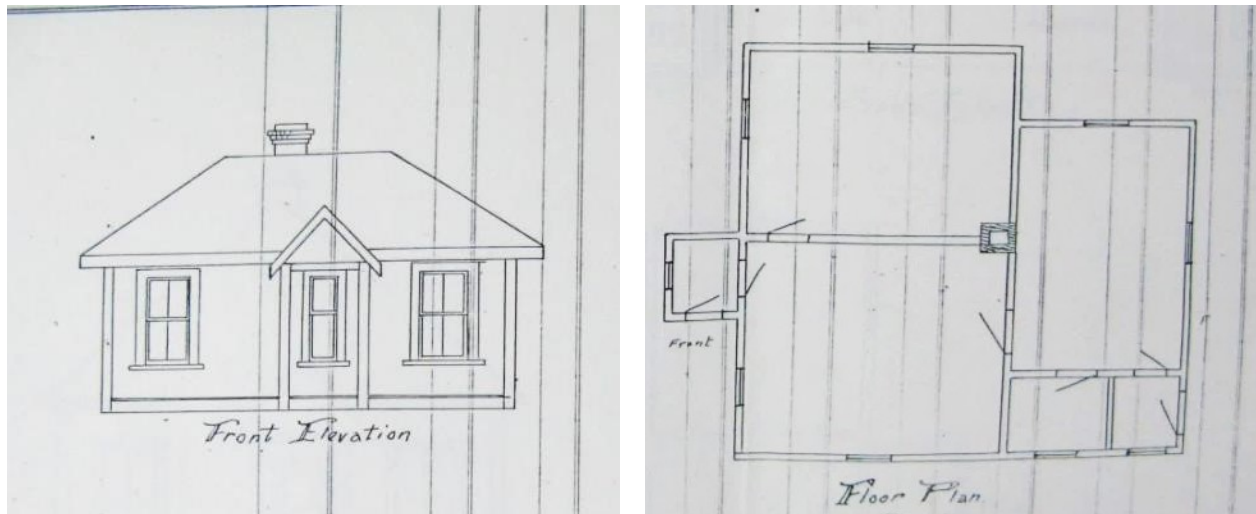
, Plan and elevation of a typical worker's bungalow, ca. 1910. Grand Falls-Windsor Heritage Society.
